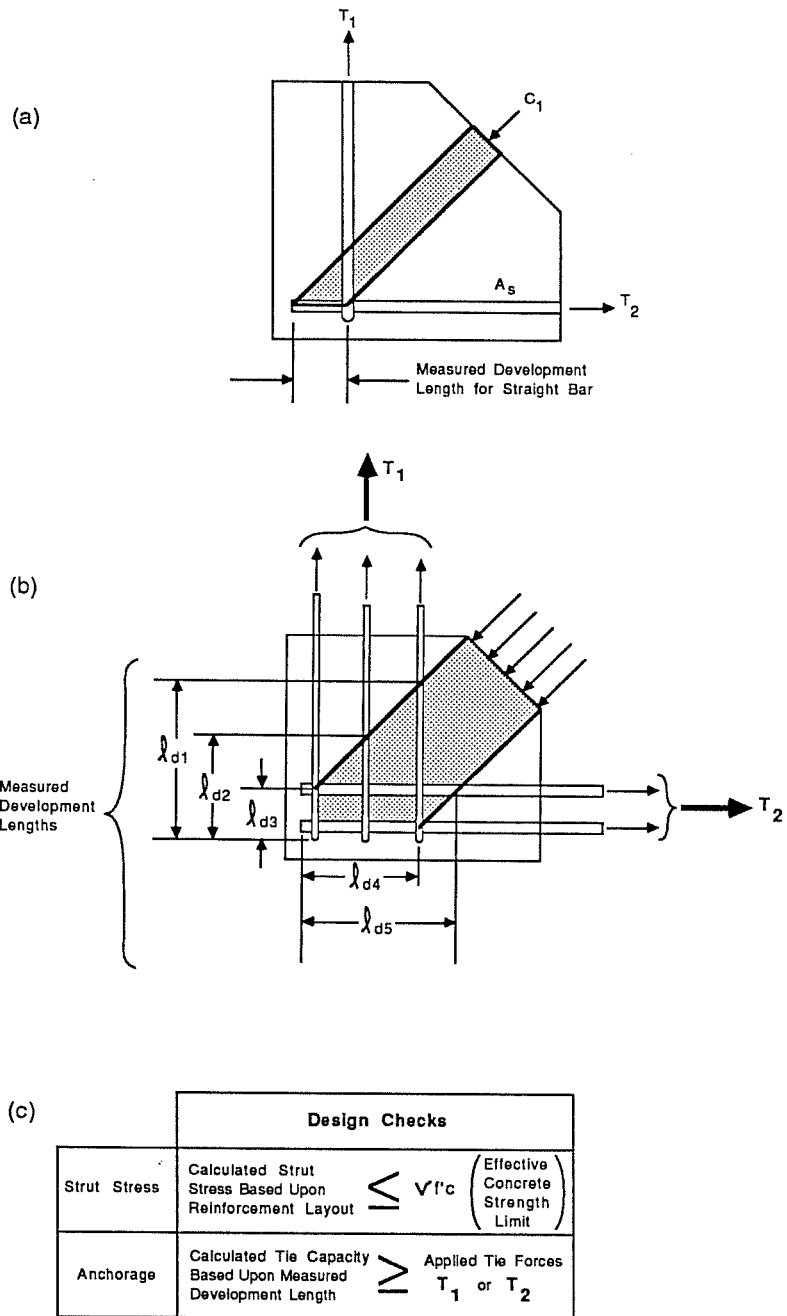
Design Checks for Ties Anchored with Single and Multiple Layers of Reinforcement
